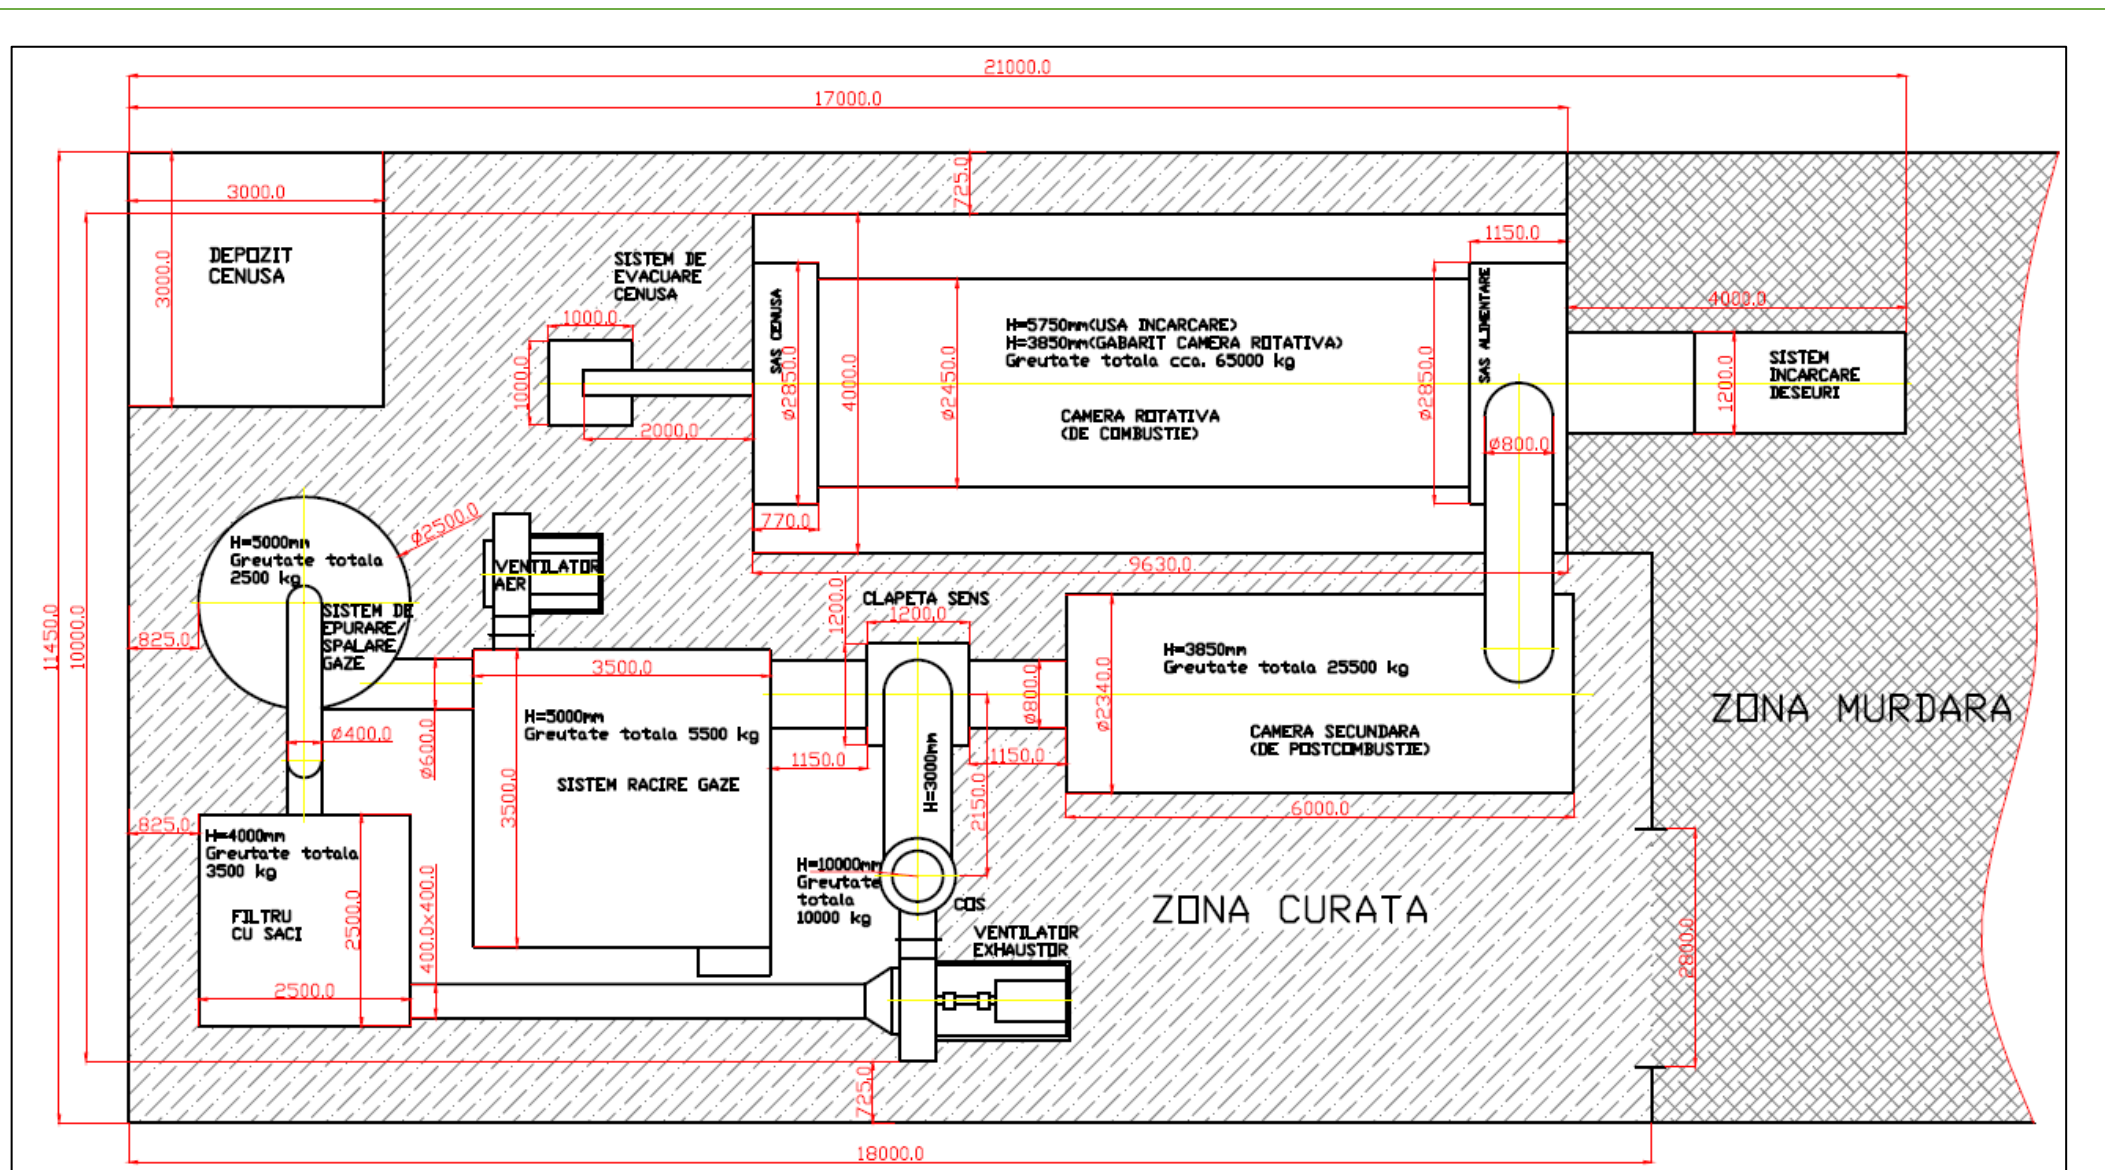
Layout of the location of the incinerator components with the gauge dimensions
